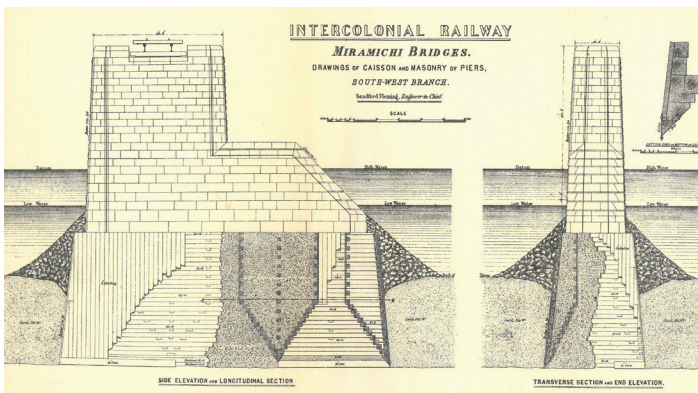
Details of the original pier and caisson construction (Fleming 1876).
